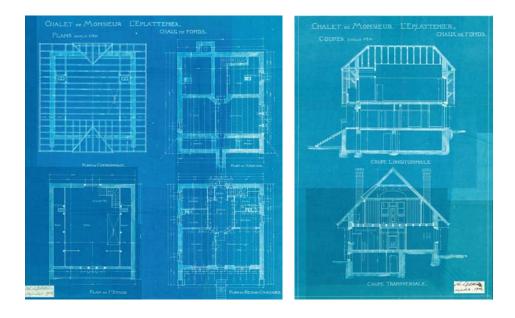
, 36 L'Eplattenier's house. Original blueprints. Plans and cross-sections, 1902.
